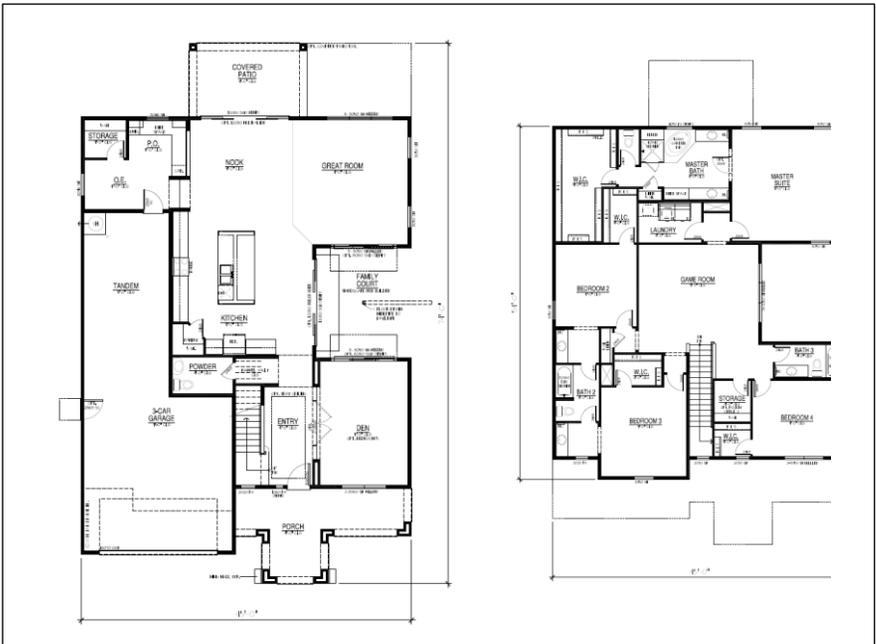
Exhibit A – Housing Product, The Seven Plans with Three Elevations (Spanish Colonial, Ranch Territorial, and Craftsman)
